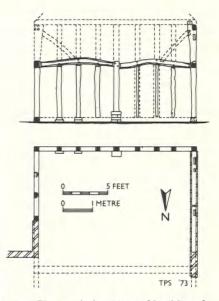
Plan and elevation of building fragment in Cumberland Street, Luton
